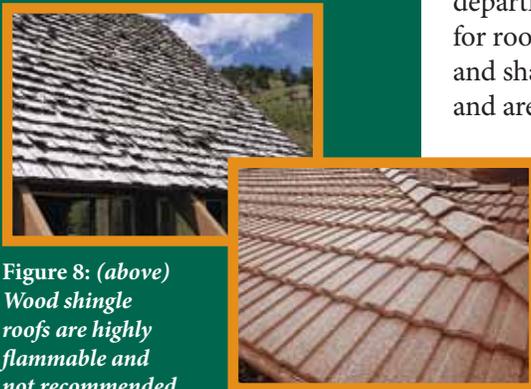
(above) Wood shingle roofs are highly flammable and not recommended. Photo: CSFS
